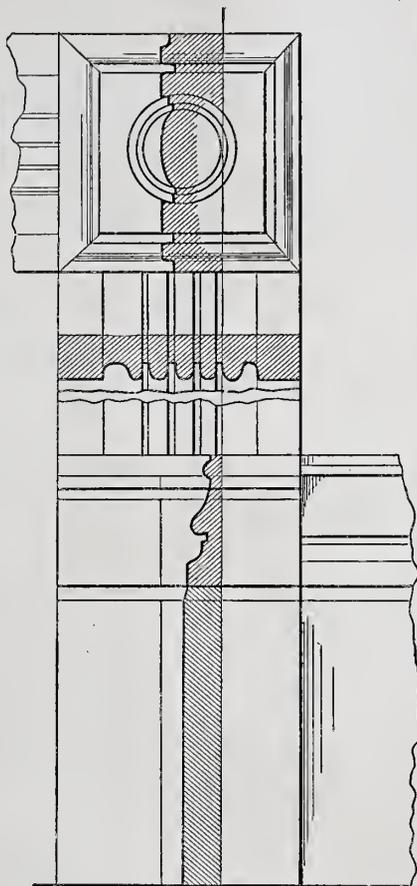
Architrave and Base in Second Story.—Scale, 3 Inches to the Foot.
